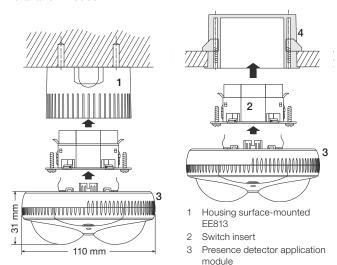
Installation in suspended ceiling or in wall-mounted housing
